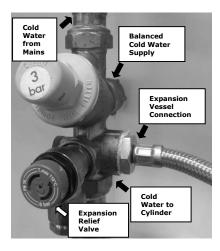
Detail showing the connection of the expansion vessel to the inlet group
